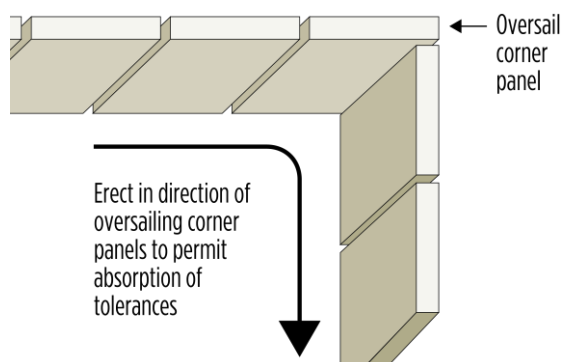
Over-sail Joint used in Tilt-up Panel Construction
